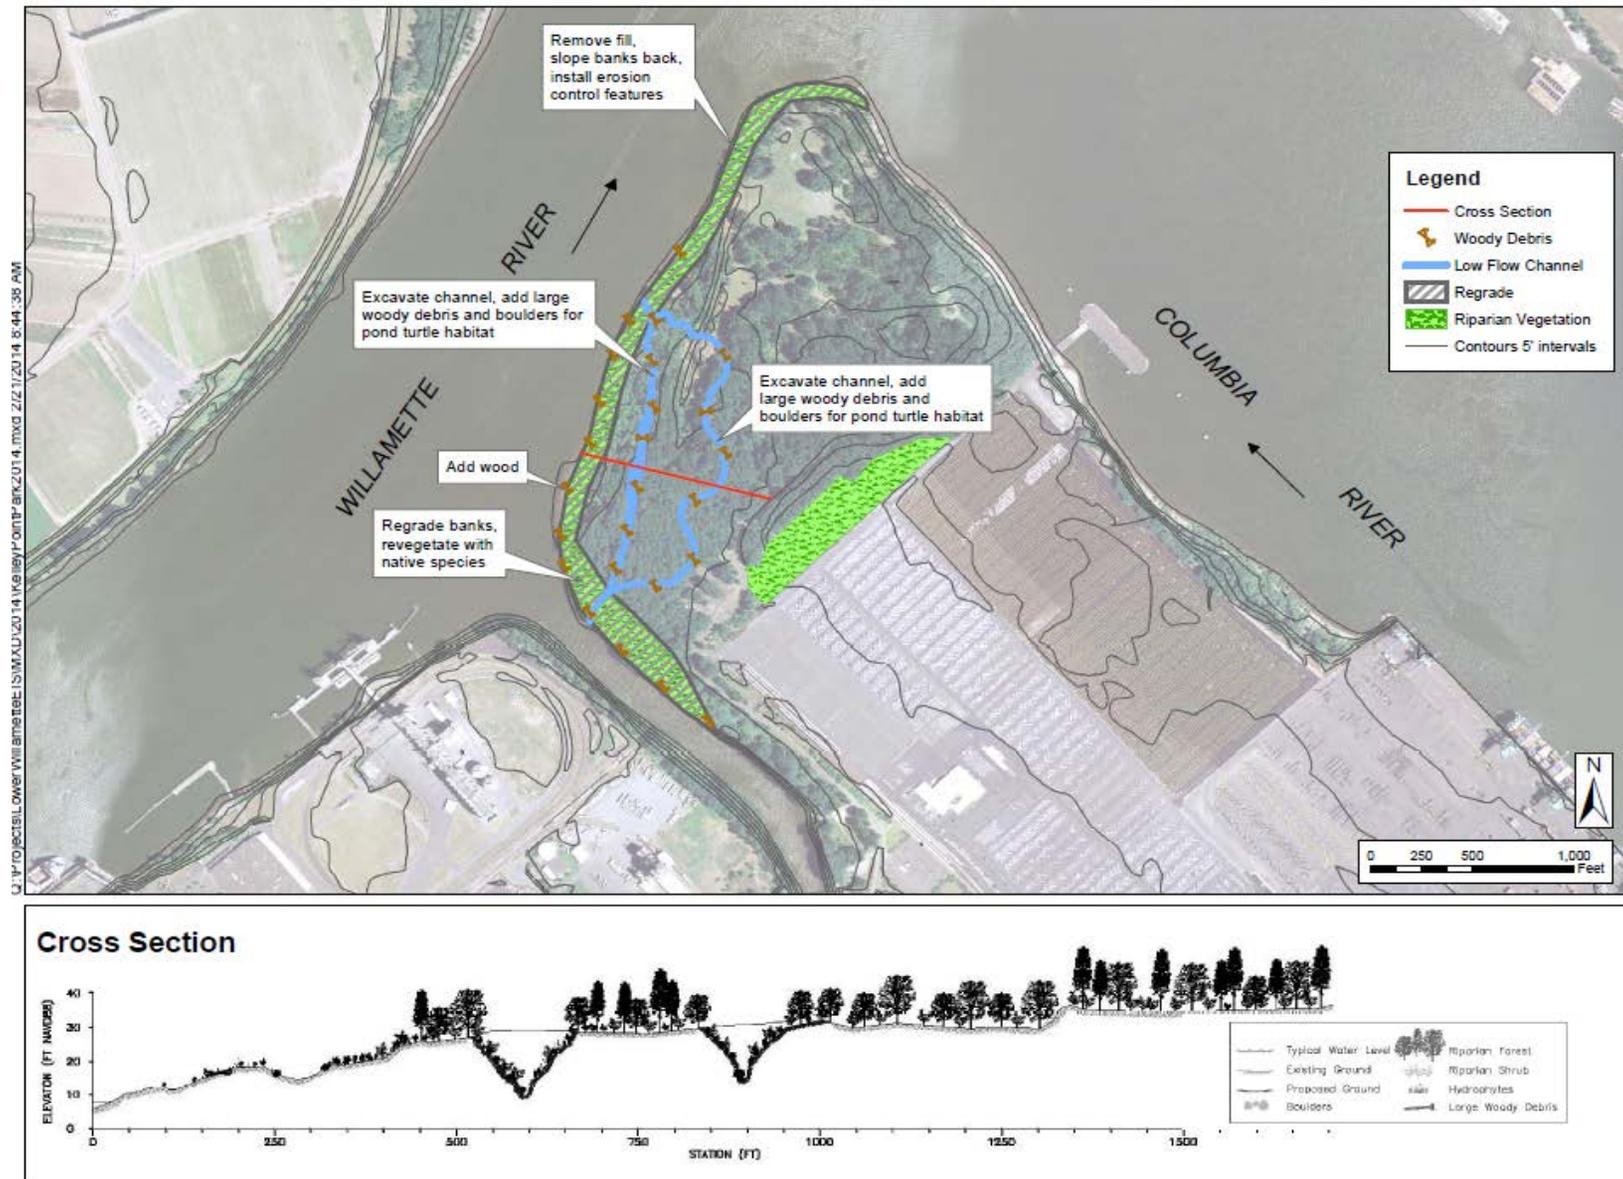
Kelley Point Park Conceptual Restoration Plan
